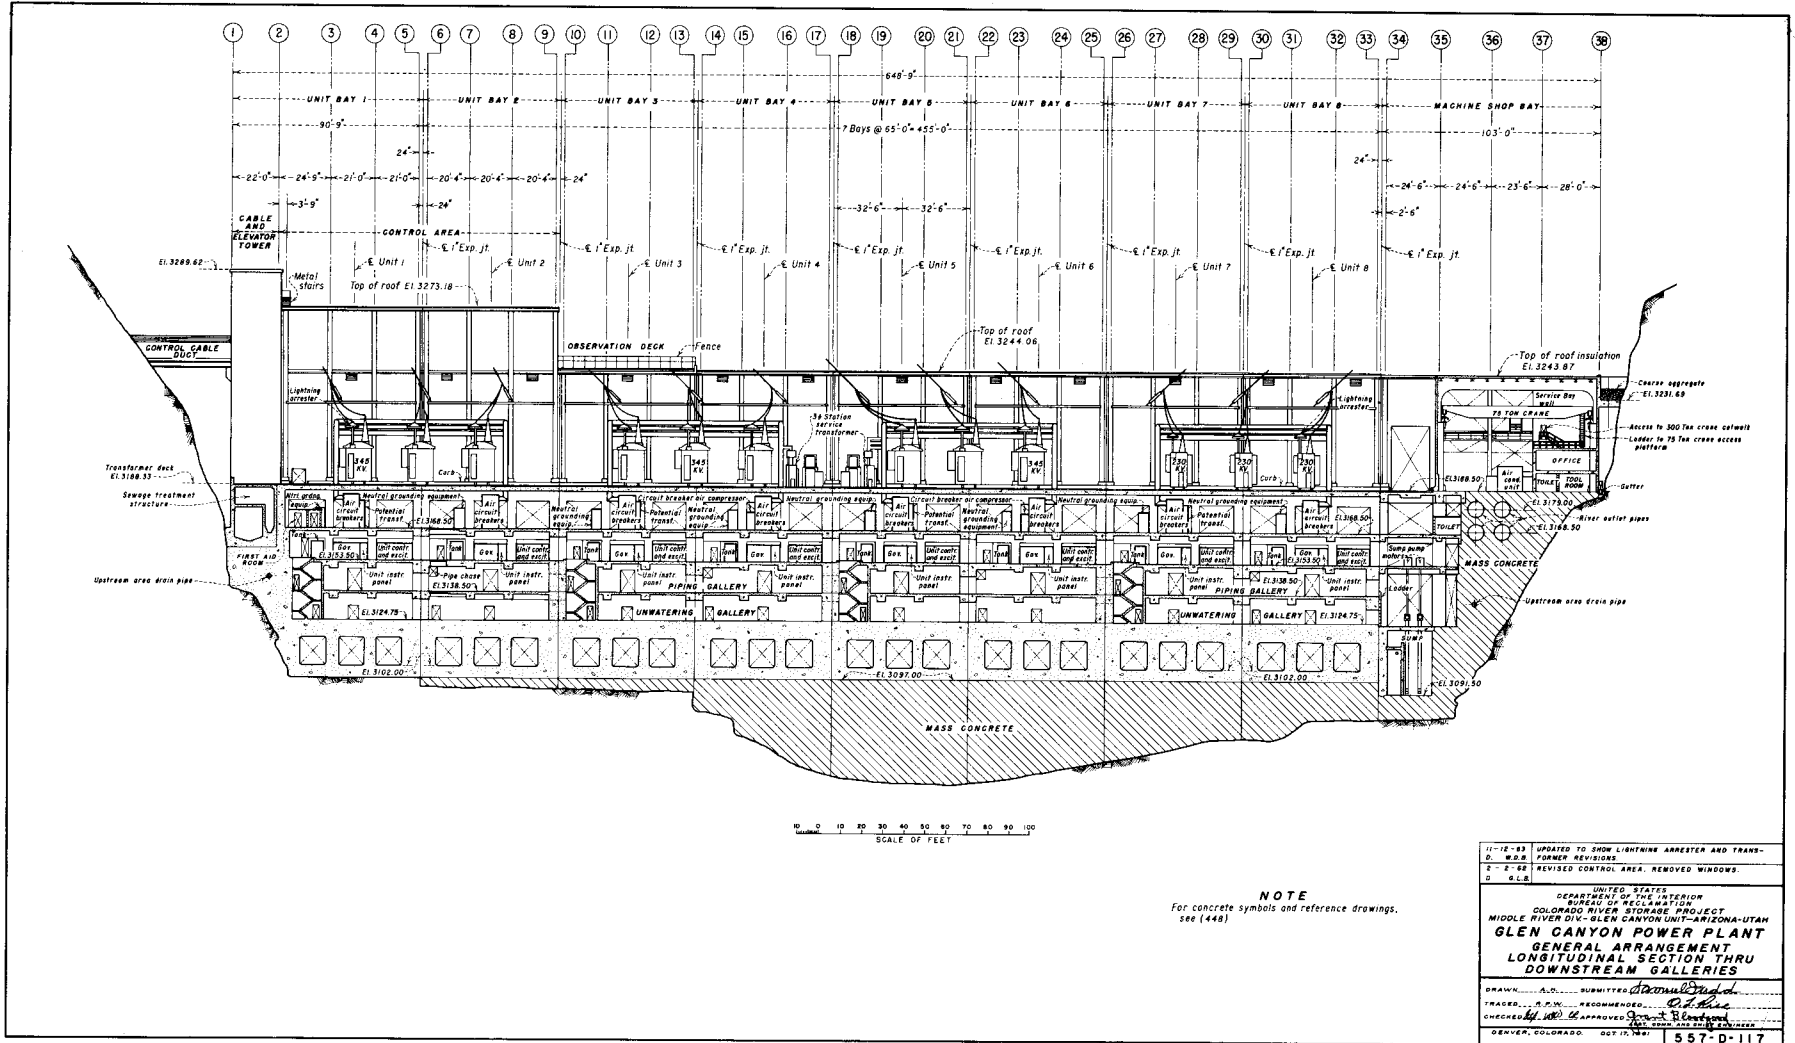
Powerplant general arrangement—Longitudinal section through downstream galleries.
